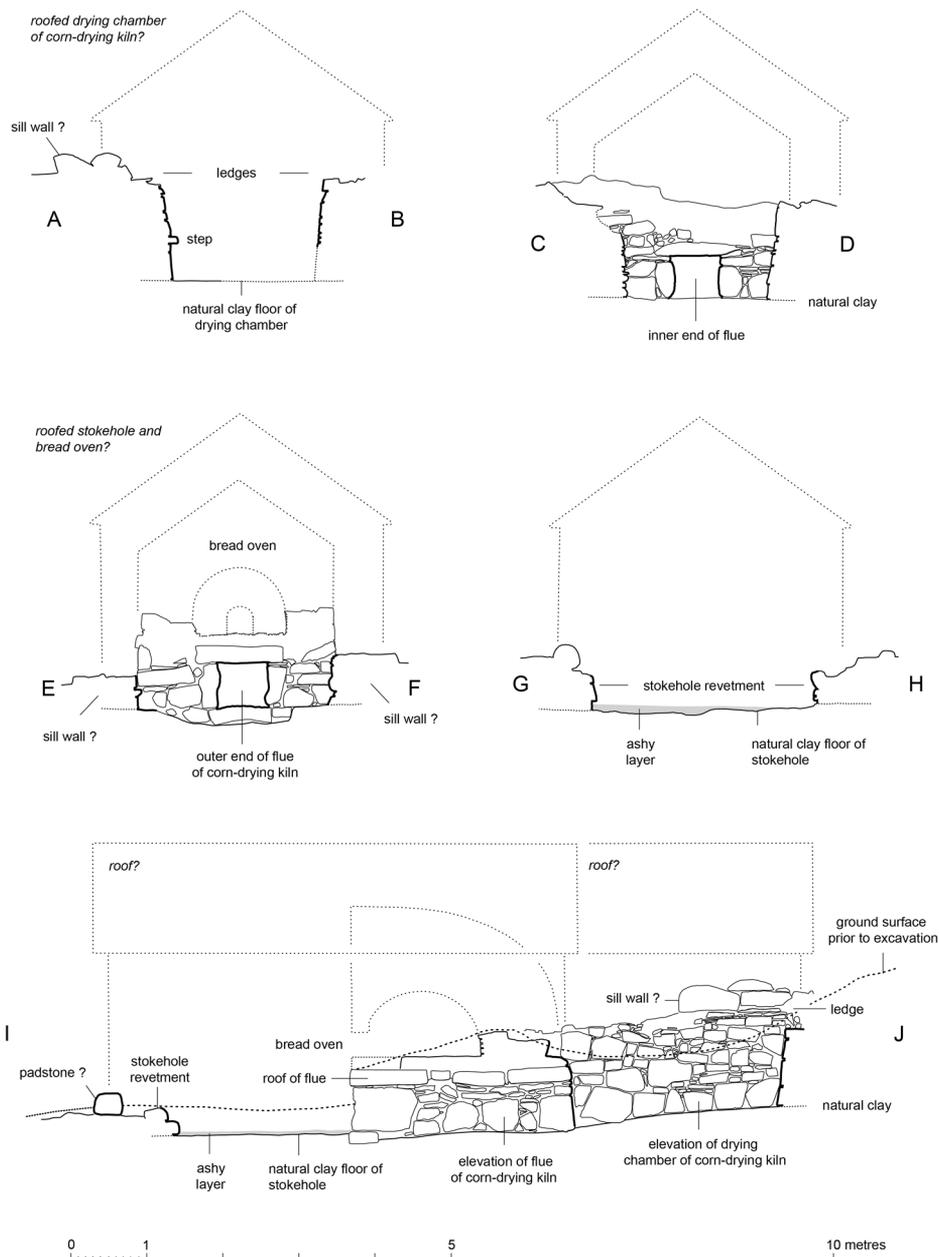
Penygraig corn-drying kiln and bread oven: profiles and elevations.
